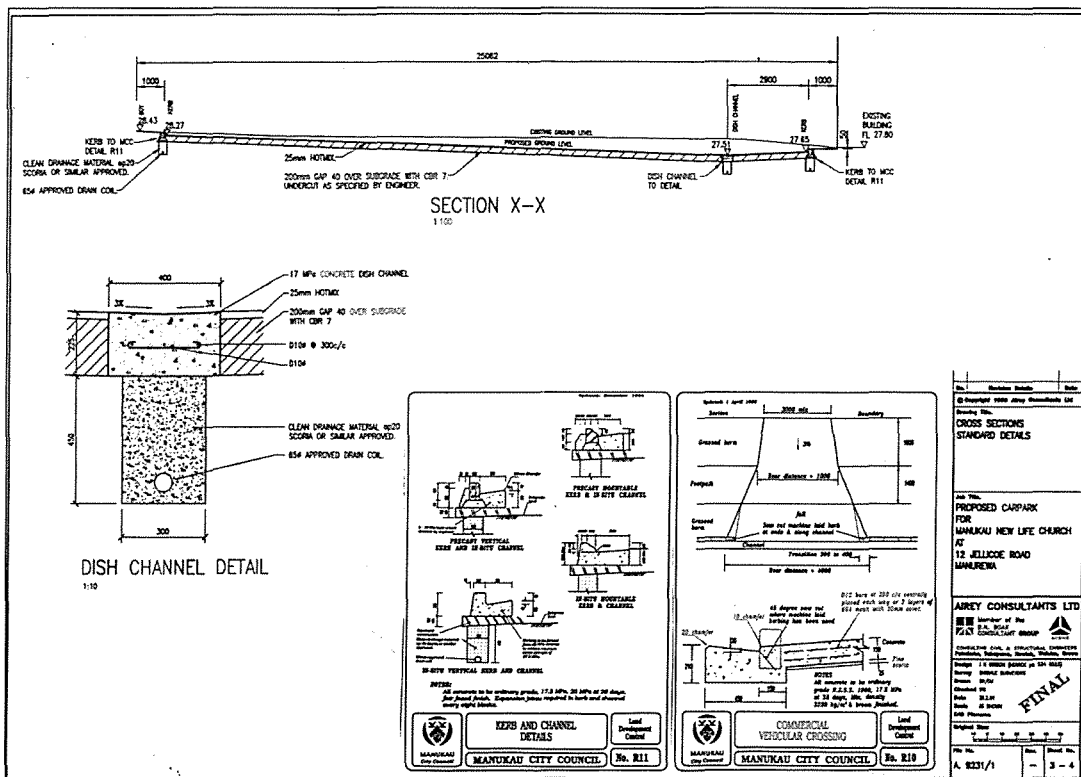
PROPOSED CROSS SECTION OF PAVEMENT AREA
